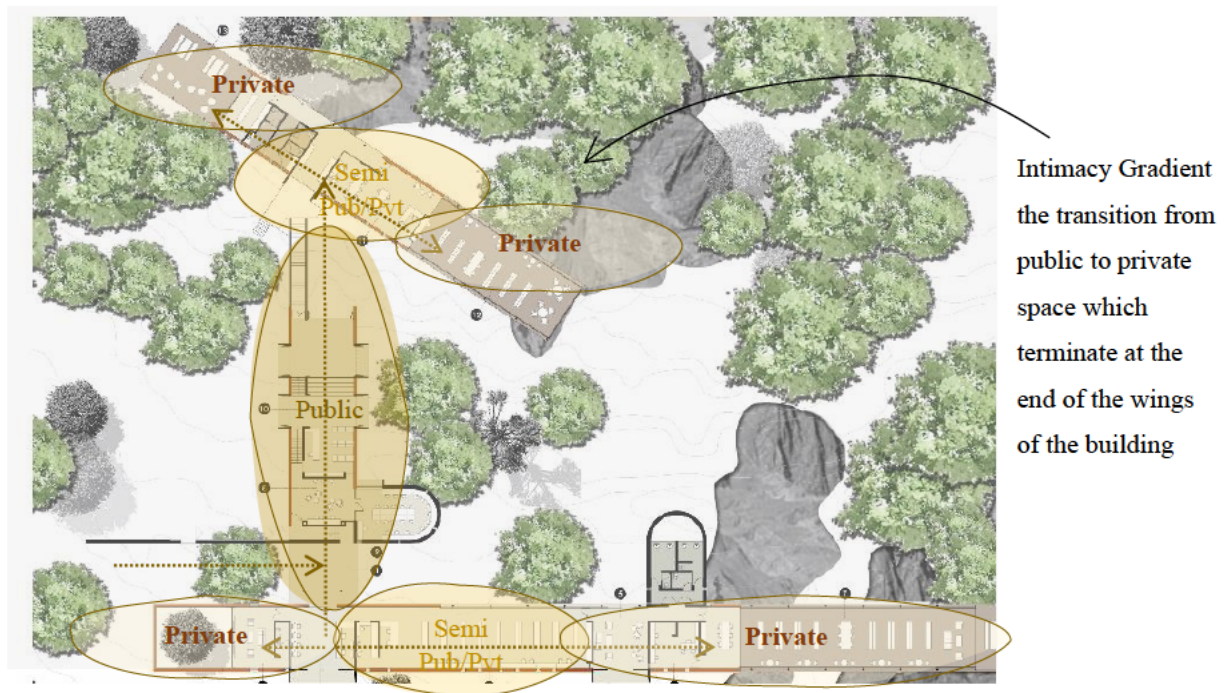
i: The Community Library floorplan. (Source: www.lafargeholcim-foundation.org)
